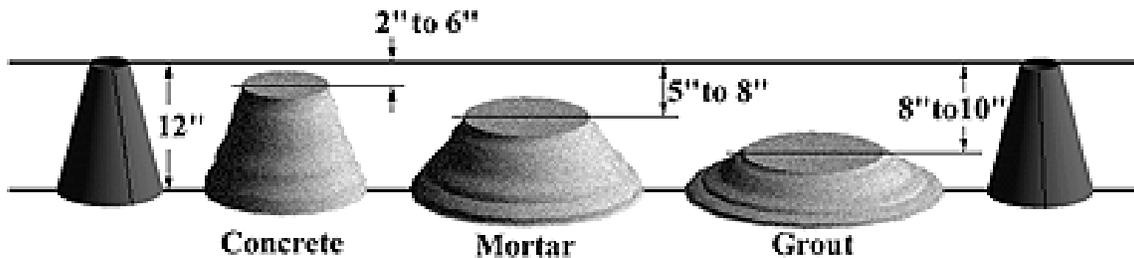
Typical Slumps for Concrete, Mortar, and Grout
